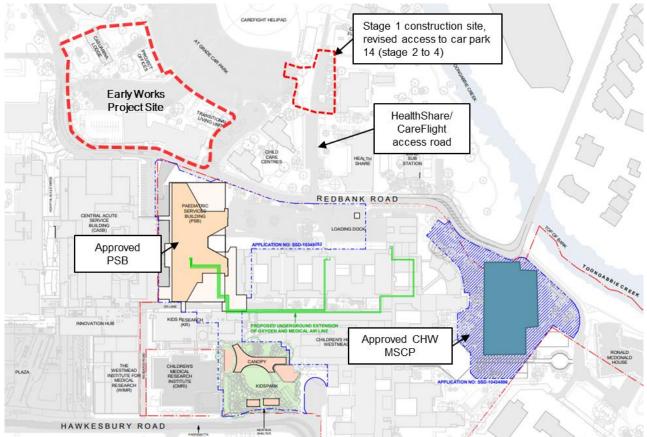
Early Works Project and CHW Stage 2 redevelopment site plan overview
